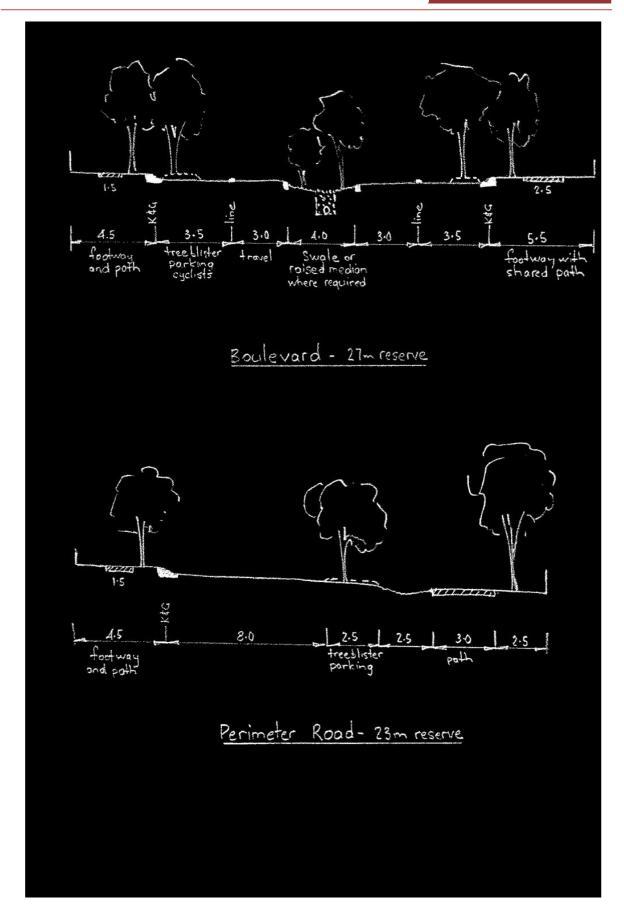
Thornton North - Typical cross-sections for WSUD drainage swales.
